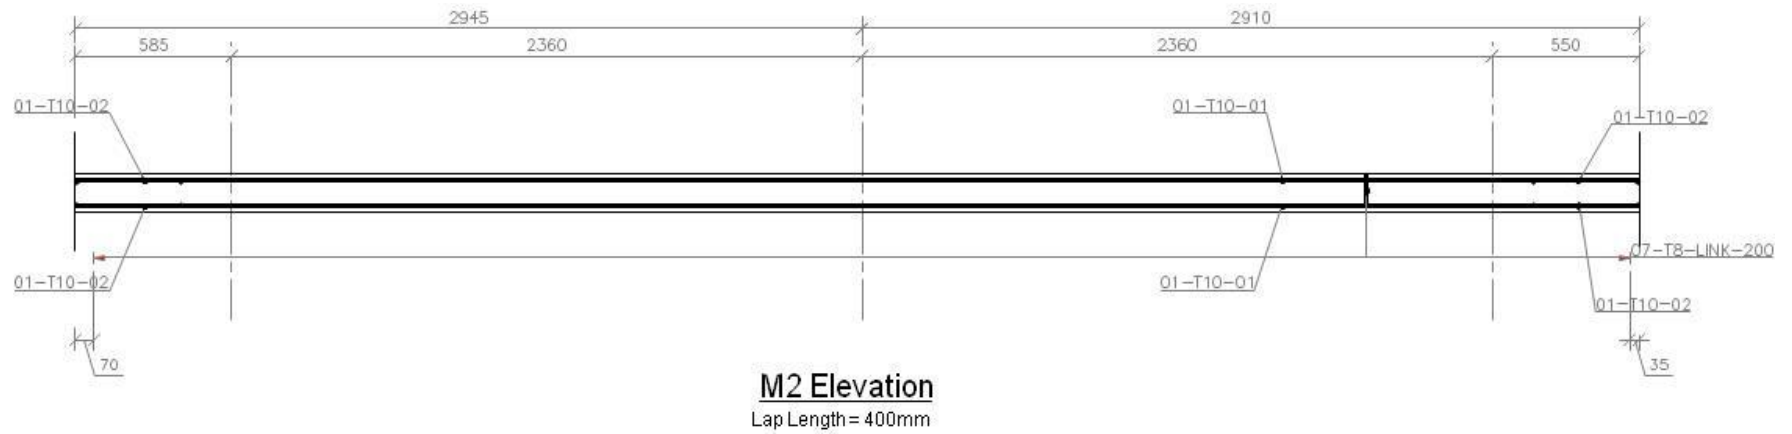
Elevation of reinforcement detailing of sample M2.
